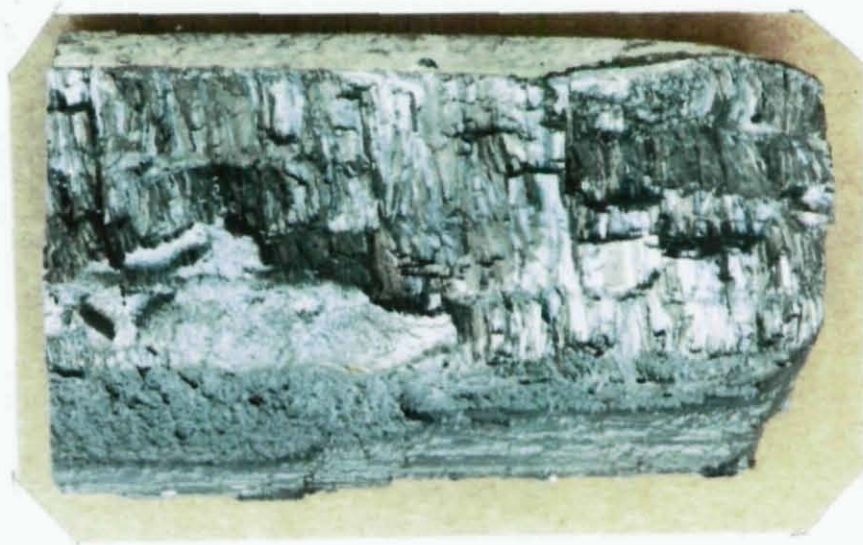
South piece from the beam-side fracture of the east-beam top-flange joint.
